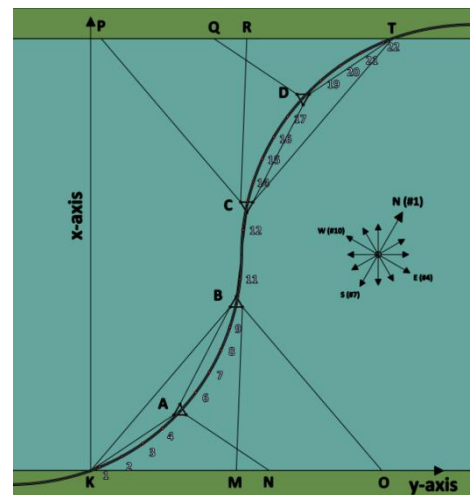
ANCHORING SYSTEM WITH FOUR ANCHORED PONTOONS [3]
